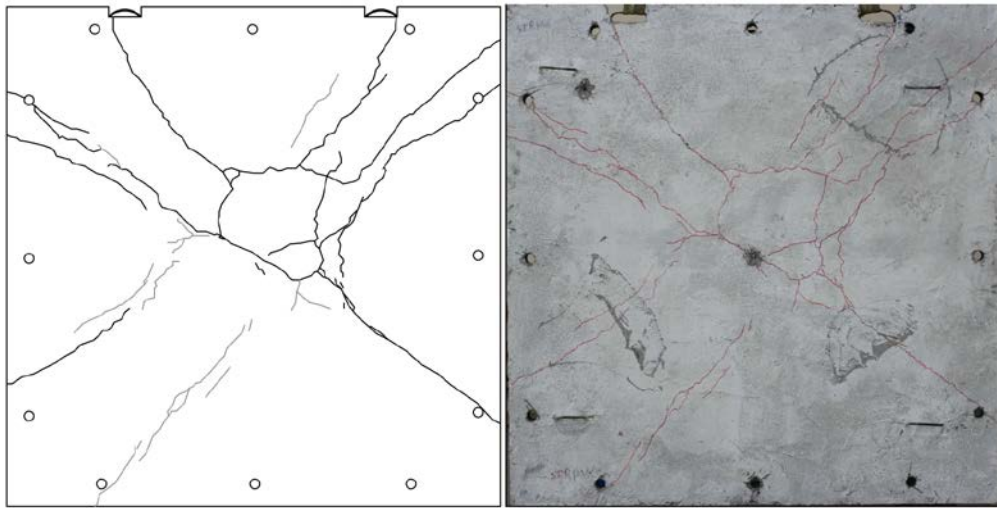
Front Face Crack Patterns After Testing for Panel JA2-075-RF+PVA
